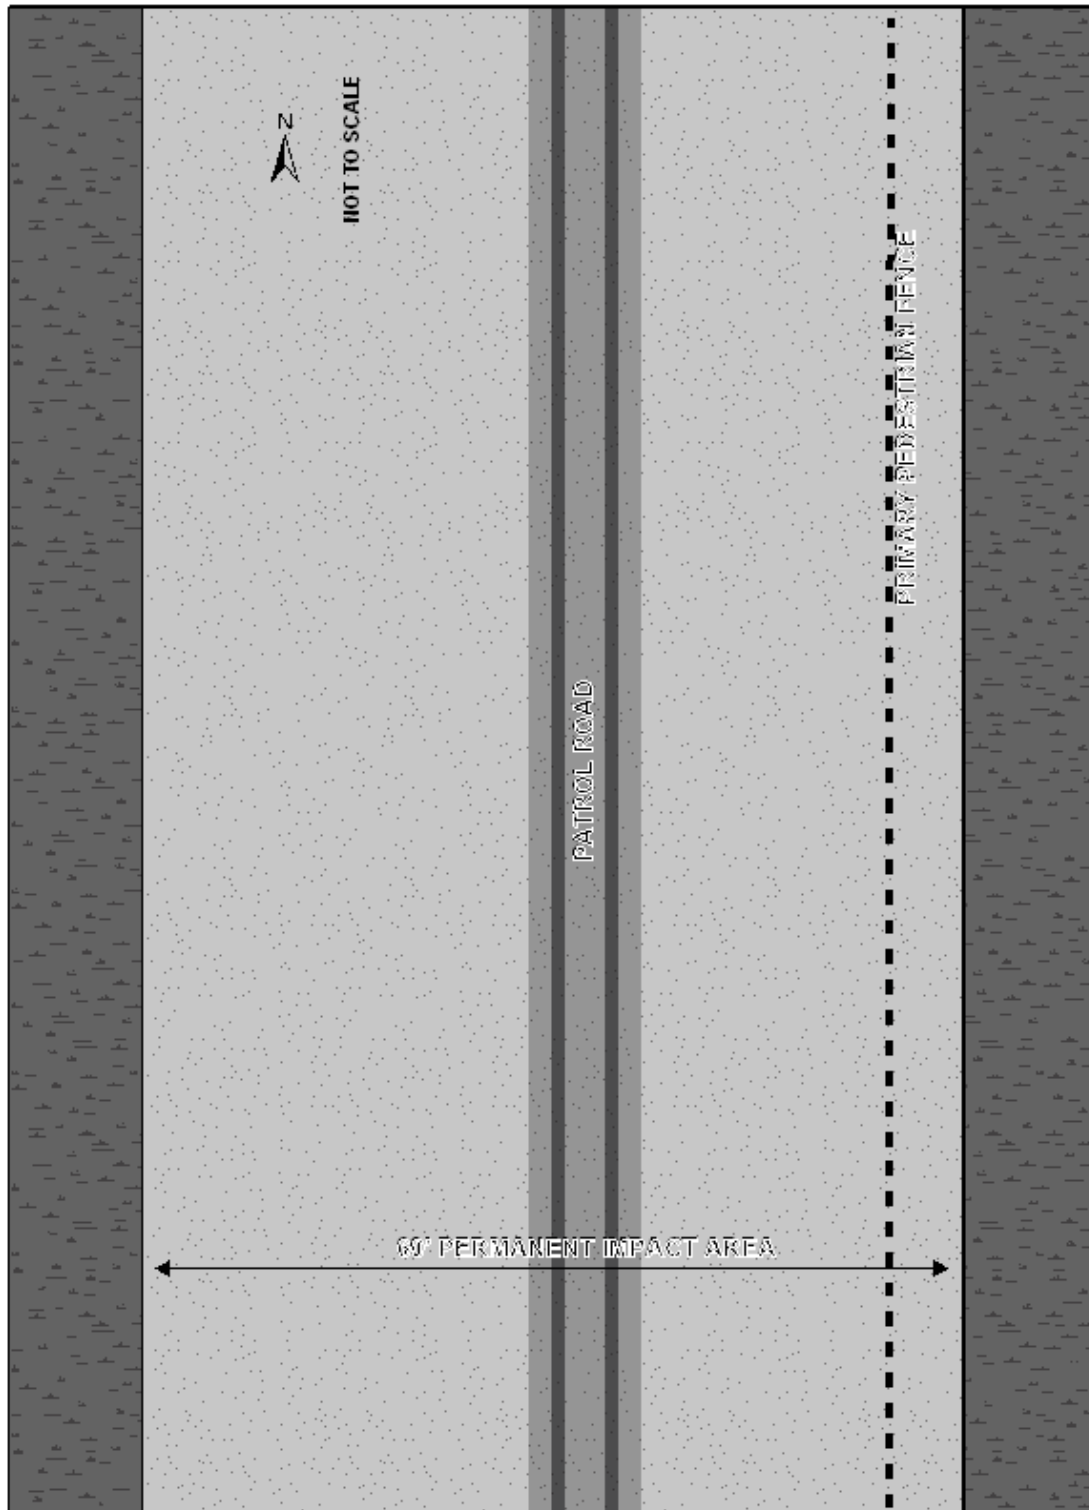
Schematic of Typical Project Footprint – Section M-2A
